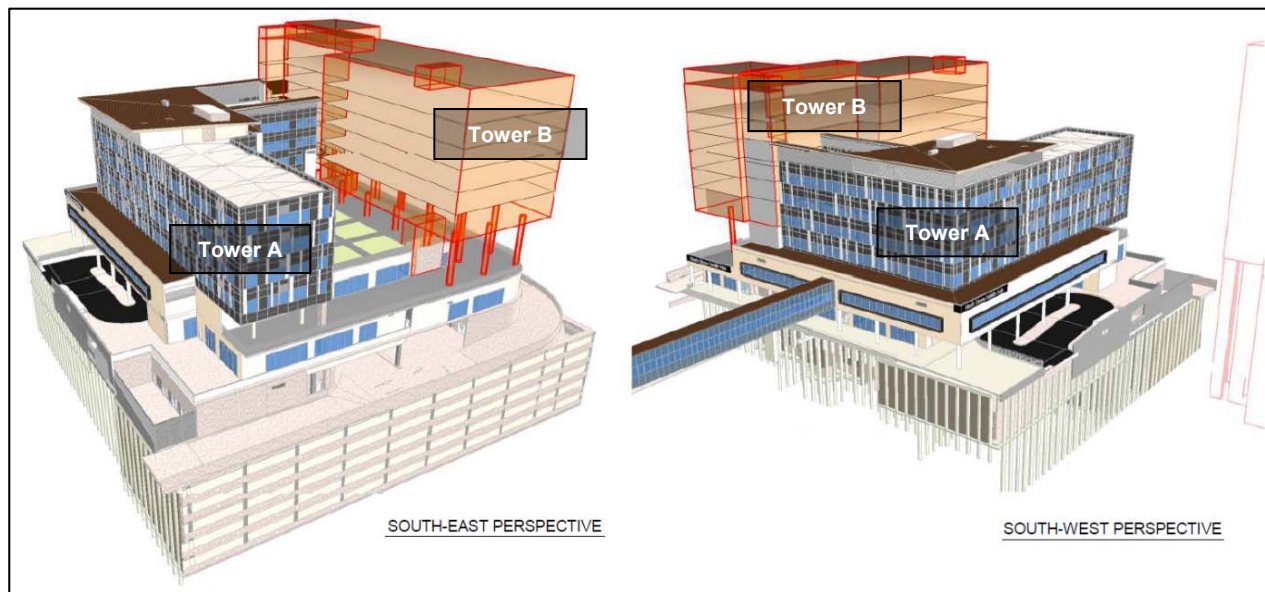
Proposed perspectives of Tower A and Tower B building envelope (Base source: Tower B RtS)
